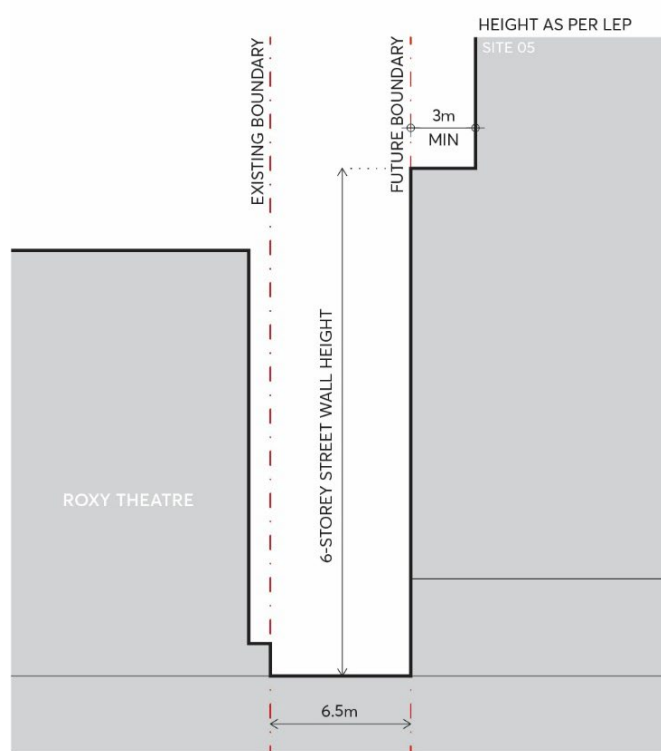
New Laneway between the Roxy and Site 05 (Section F)
